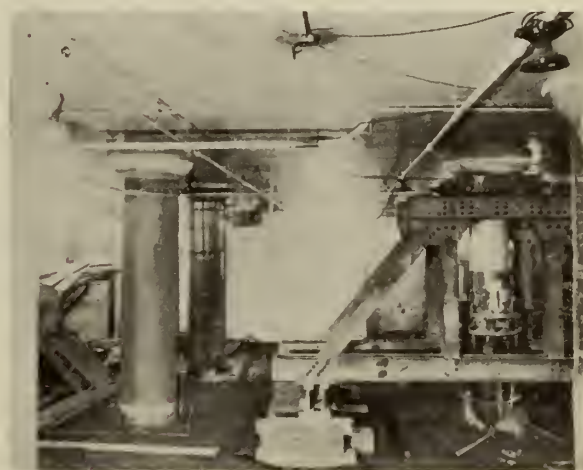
General view of a working area, showing operation complete and jacks removed, one column furred ready for plastering and a third with first coat. Note "follow-up" blocking under end of shoring truss.
